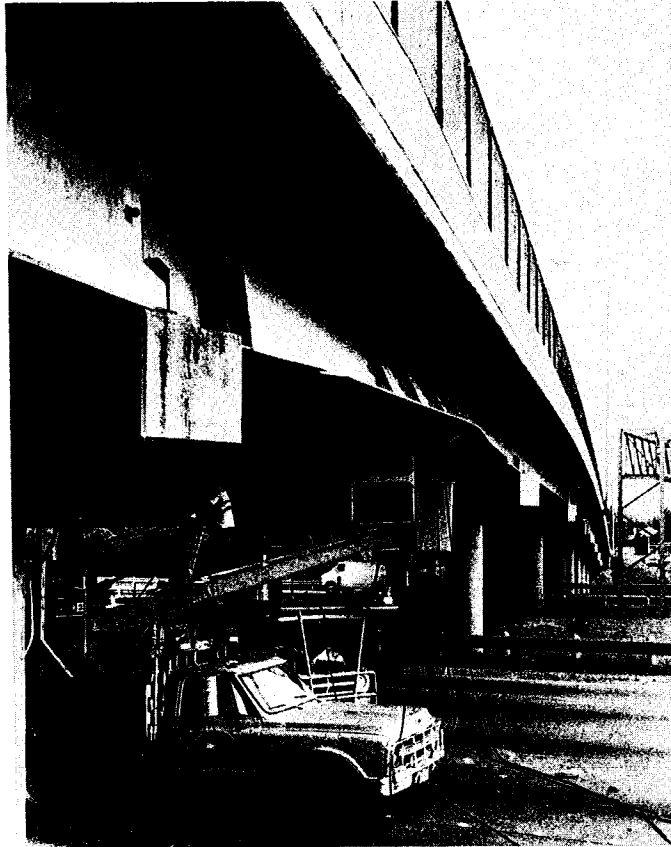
HOUSTON AVENUE OVERPASS ON
